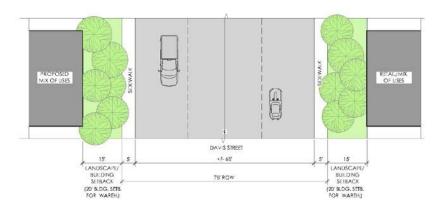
Hemlock Avenue and Davis Street Plan B
